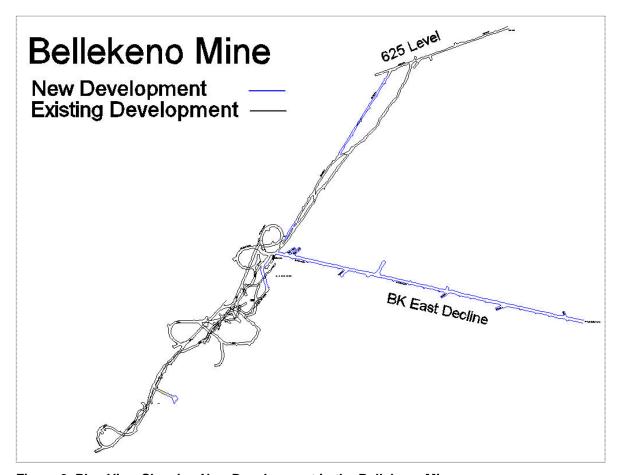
Plan View Showing New Development in the Bellekeno Mine
